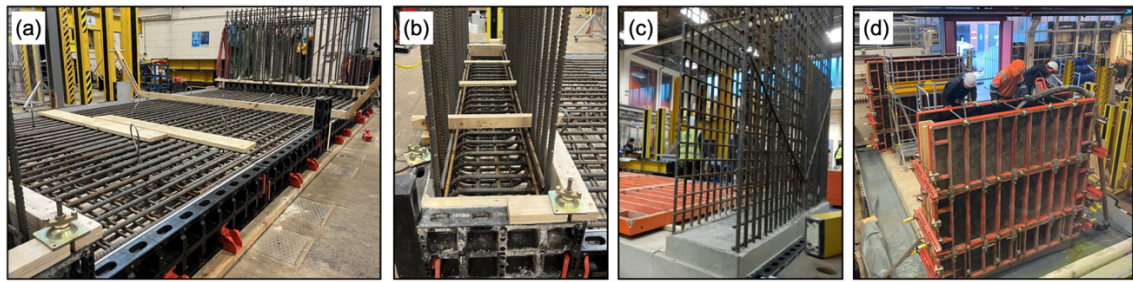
Base slab and RC end walls: (a) reinforcement layout for the base slab; (b) reinforcement layout for slab-vertical wall connection; (c) reinforcement layout for end walls; and (d) pouring concrete for RC end walls.
